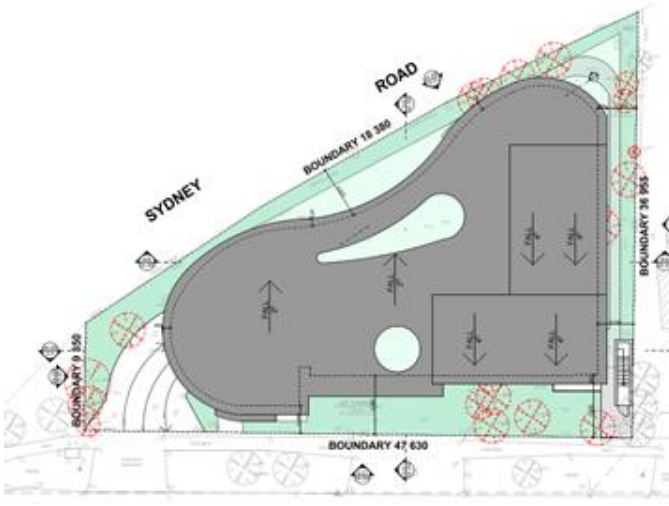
Site plan showing the proposed building and landscaped area including deep soil zone.
